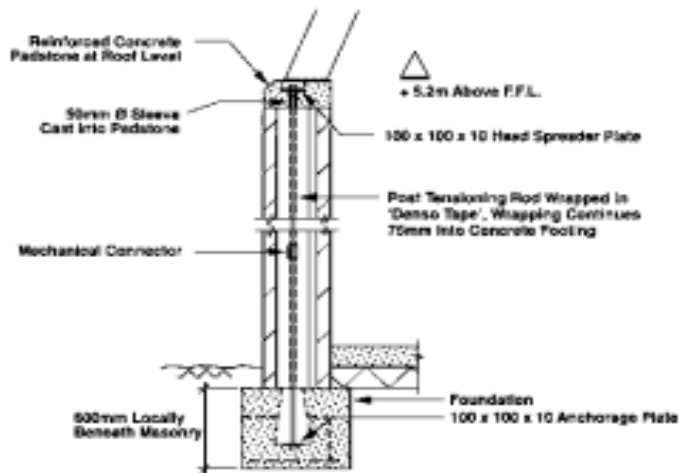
Wall Section Orsborn Memorial Hall, [24], Courtesy of Curtins Consulting Engineers
